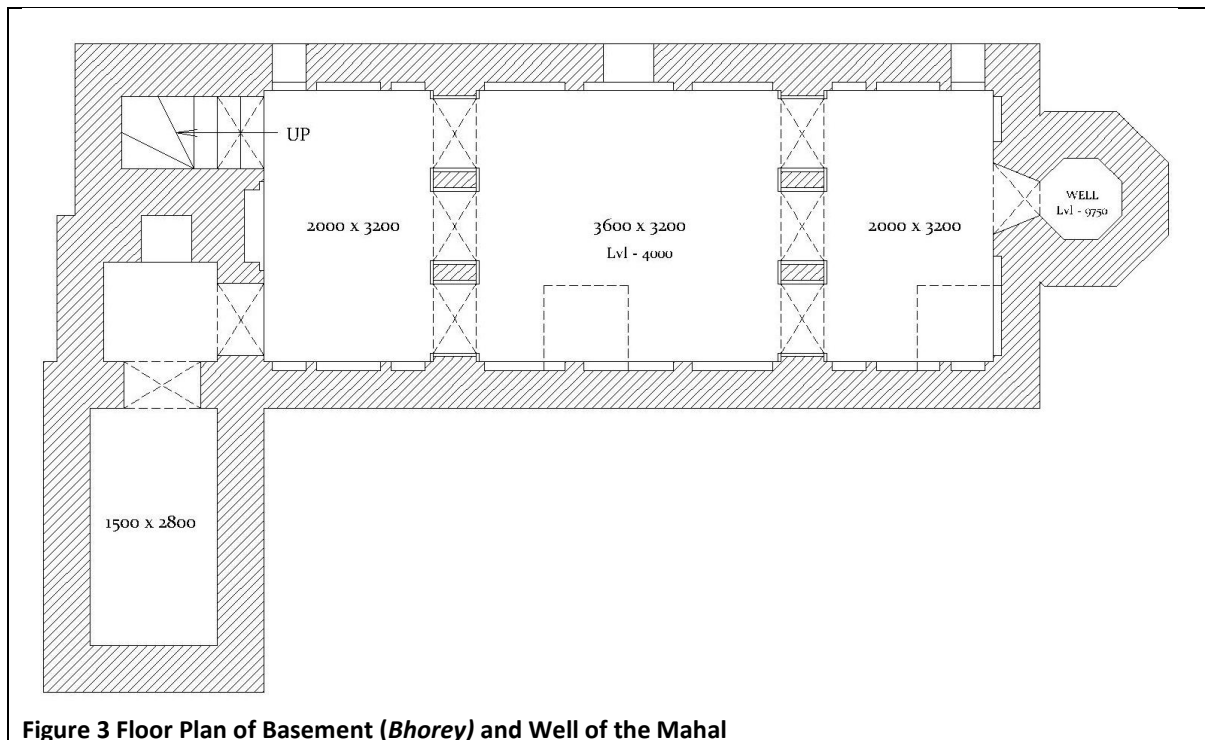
Floor Plan of Basement (Bhorey) and Well of the Mahal
